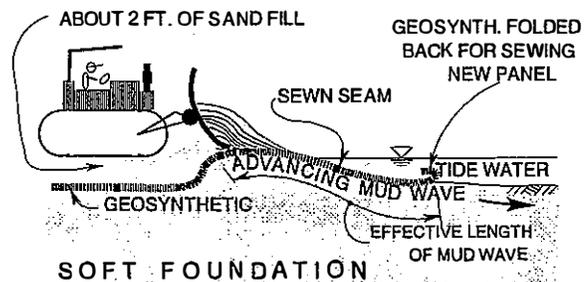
Mud wave exerting drag force on sewn geotextile panels.
